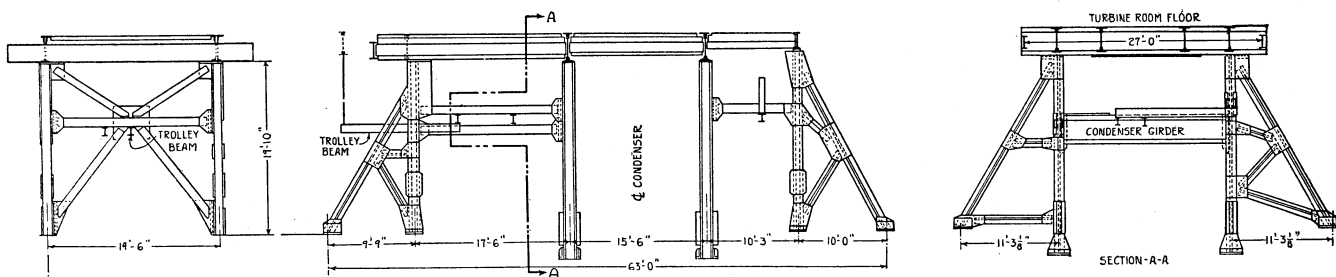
STRUCTURAL STEEL FOUNDATIONS HAVE MORE OPEN SPACE UNDER THE TURBINE
